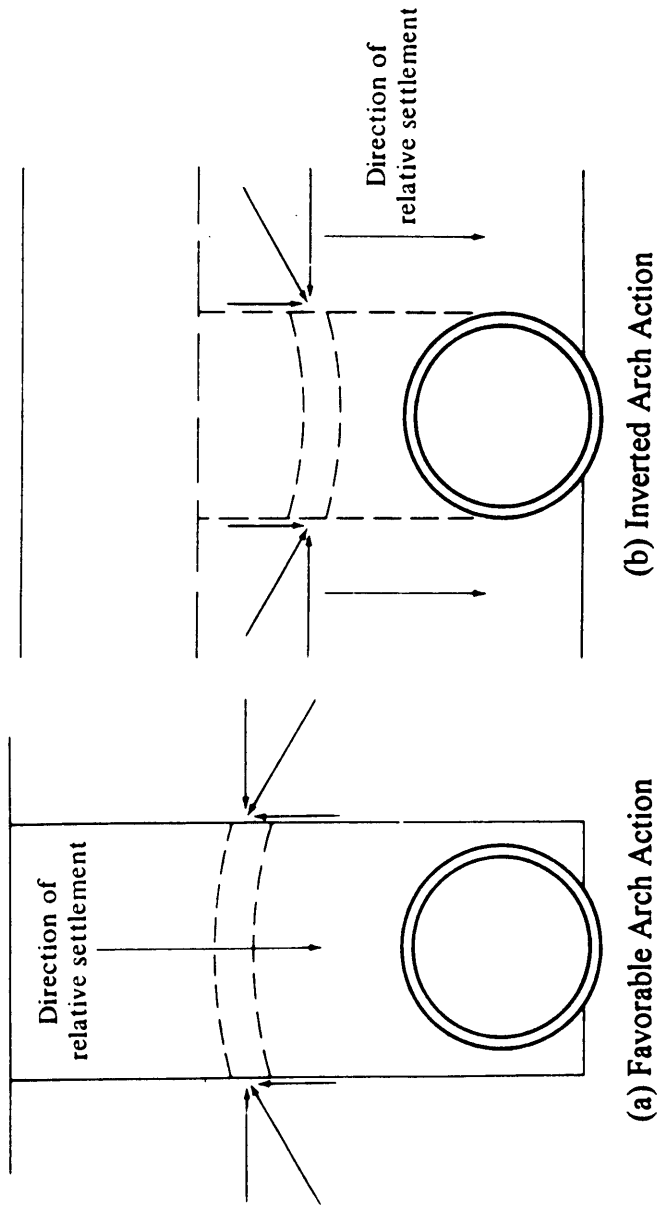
Arching Effect in Underground Conduits: (a) Favorable Arch Action, (b) Inverted Arch Action (Spangler & Handy, 1973)
